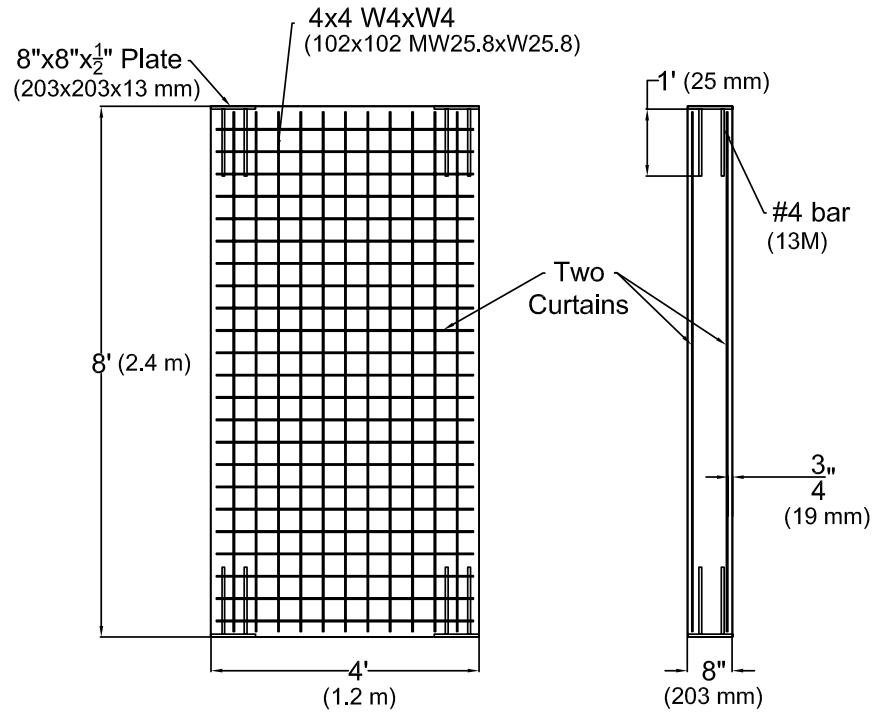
Individual concrete wall panel dimensions and reinforcement details.
